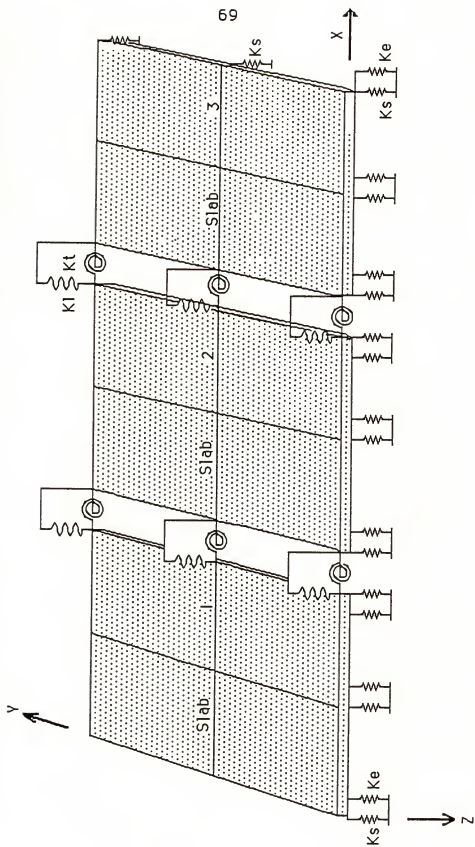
Finite Element Modeling of a Three Slab Pavement System
